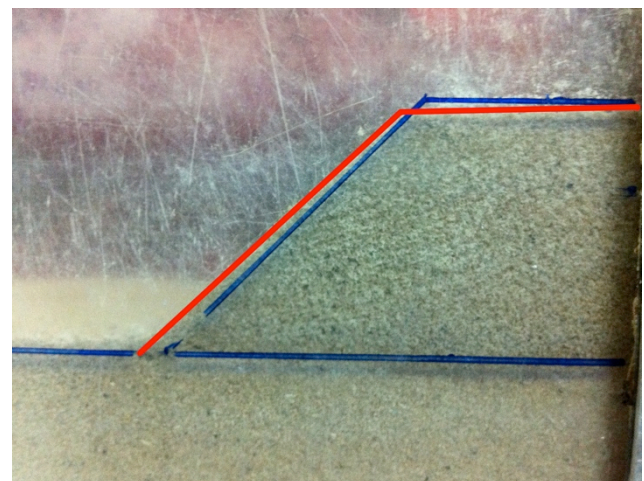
Deformation behavior of model II (unreinforced embankment on stiff foundation)
